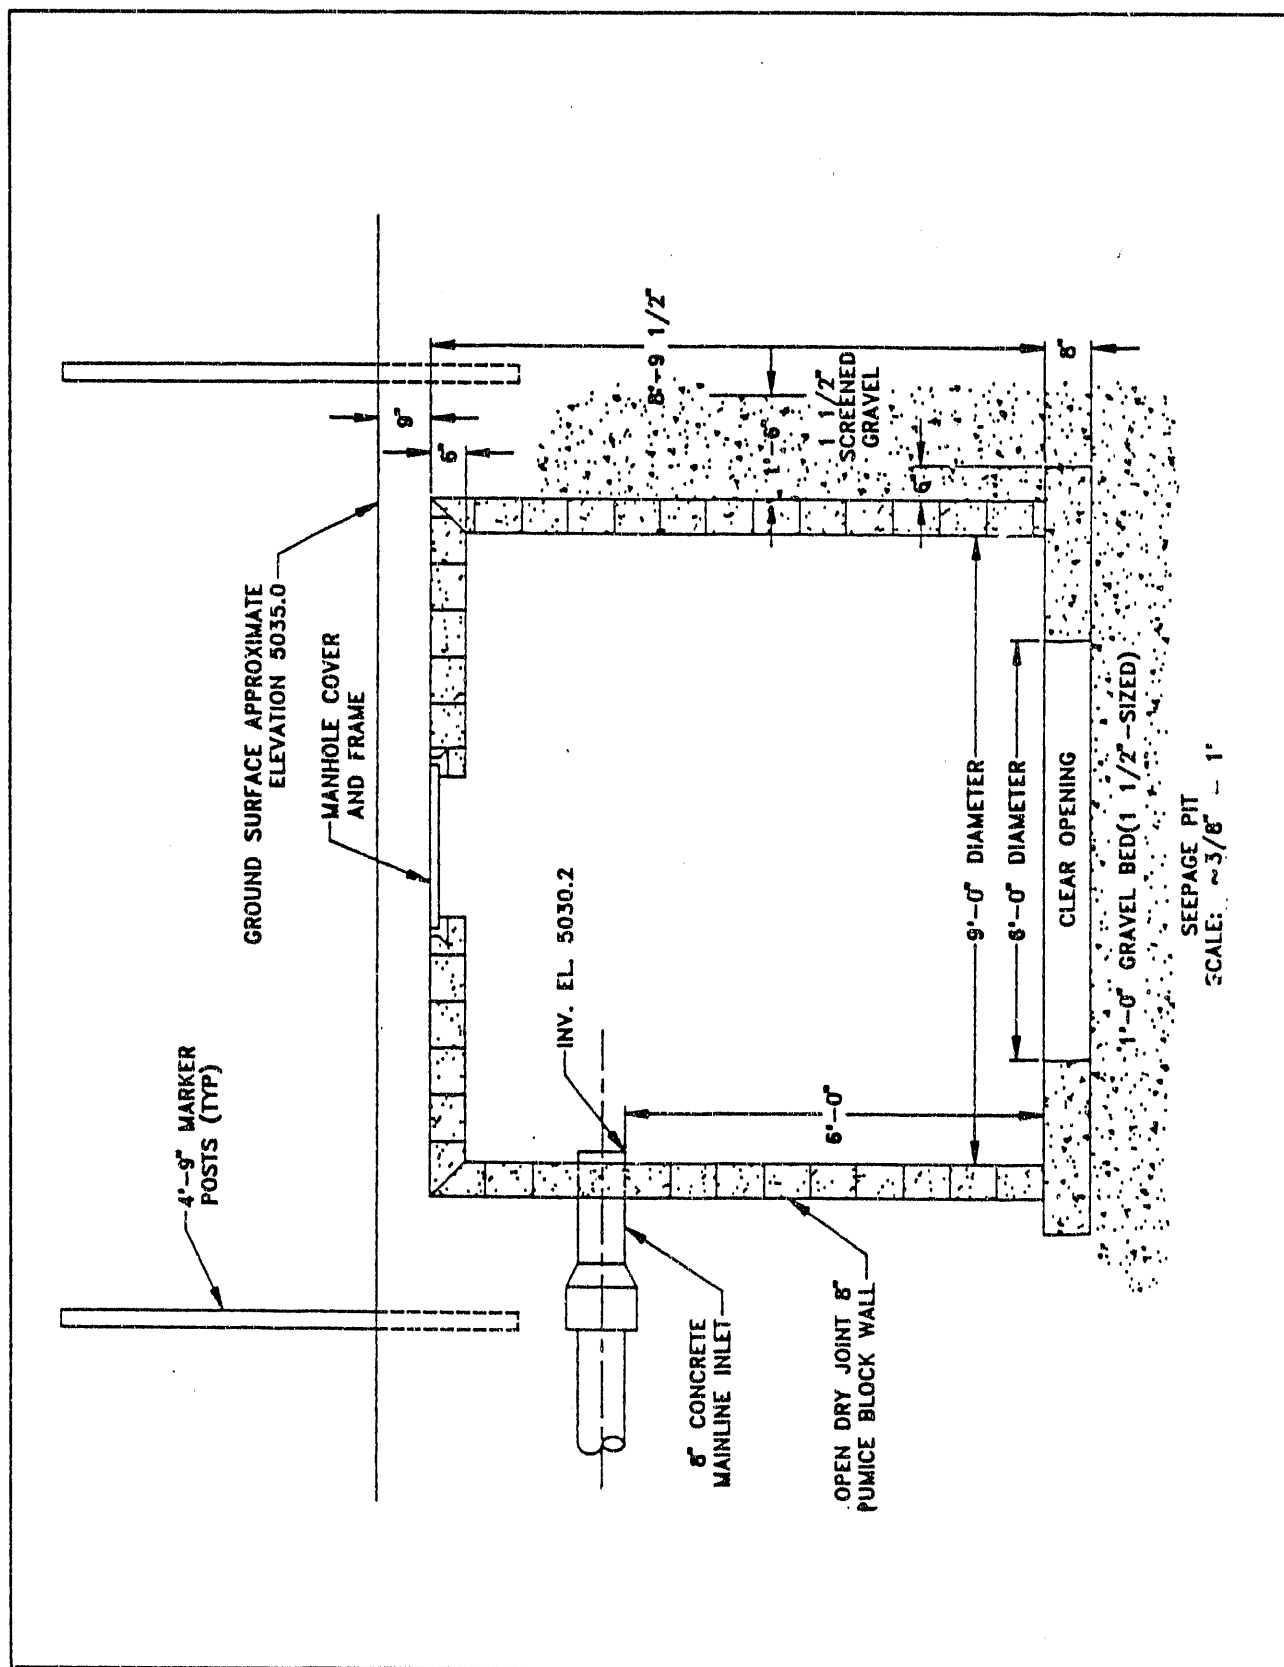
Construction details of the ARA-02 septic system seepage pit.
